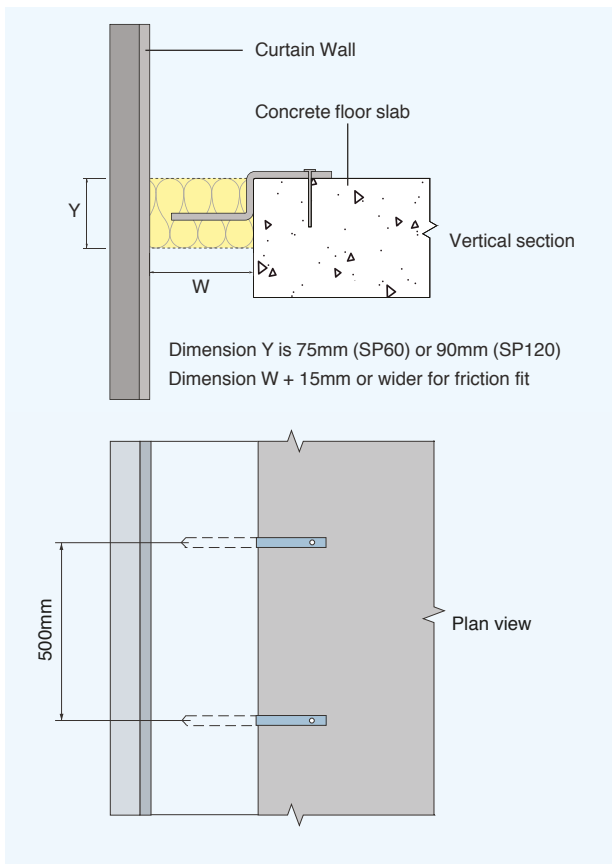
Figure D: ROCKWOOL SP Firestop Slab between floor and curtain wall
